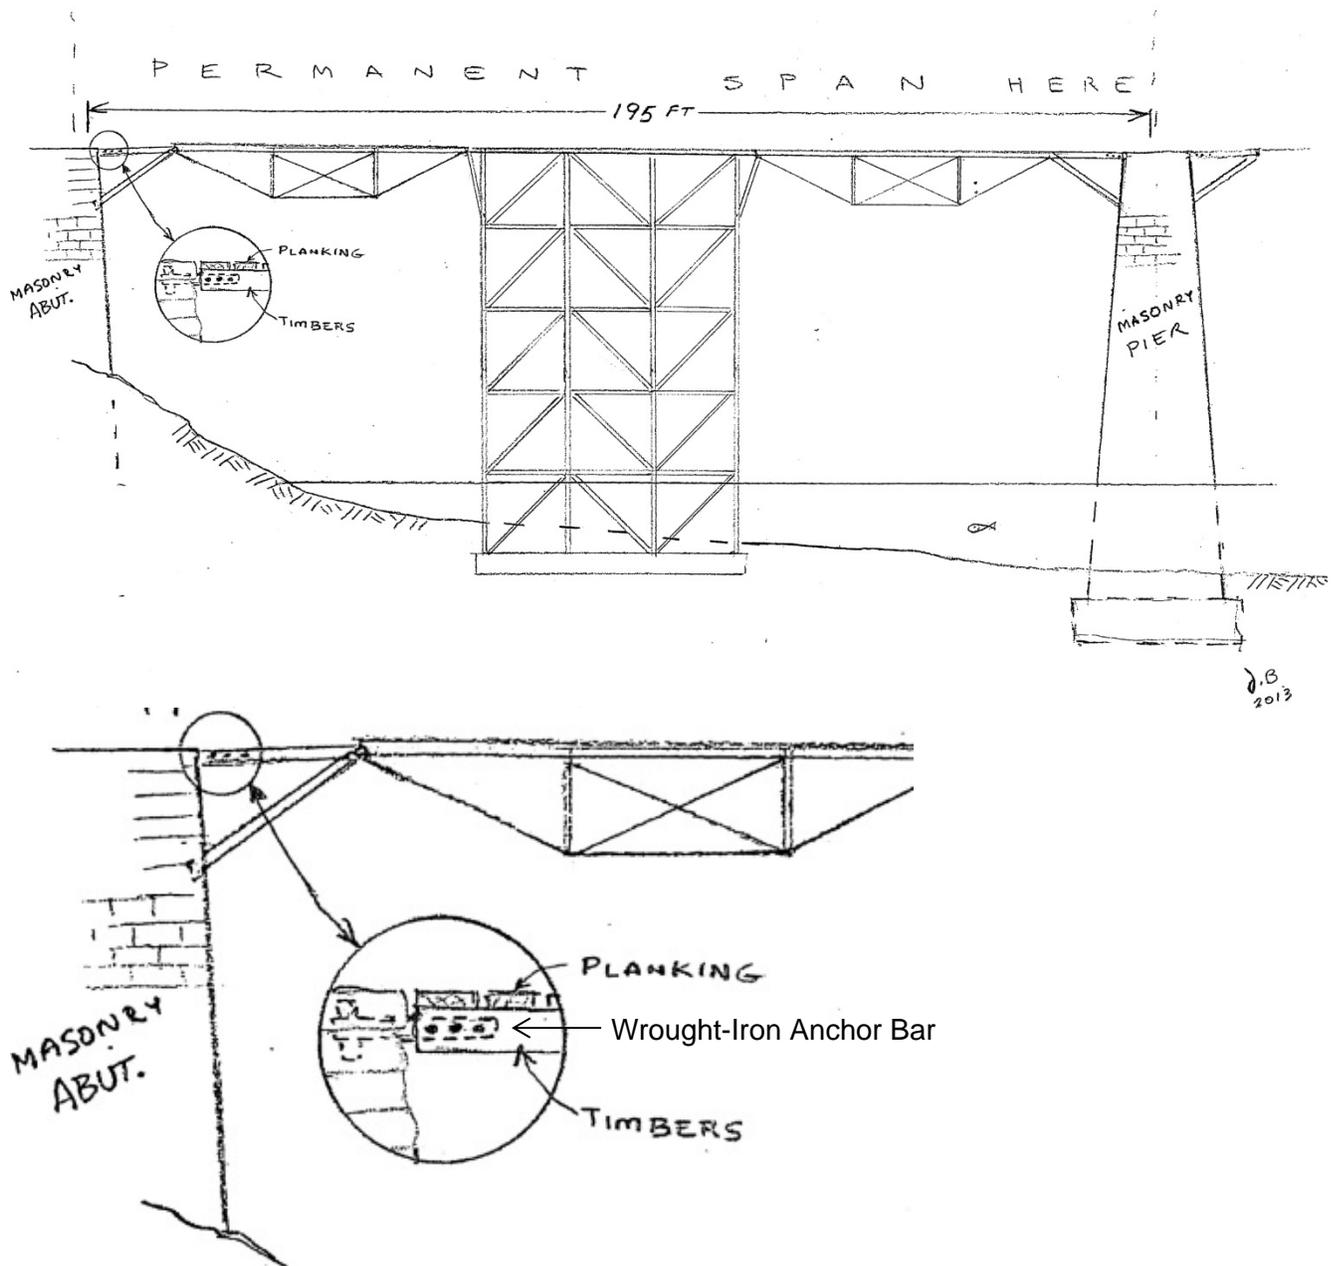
A speculative sketch that shows how the iron anchor bars may have held timbers supporting decking, and how the pockets may have supported bracing. The falsework and hanging trusses could have been reused for all three trusses. Drawing by James Barker, 2013.
